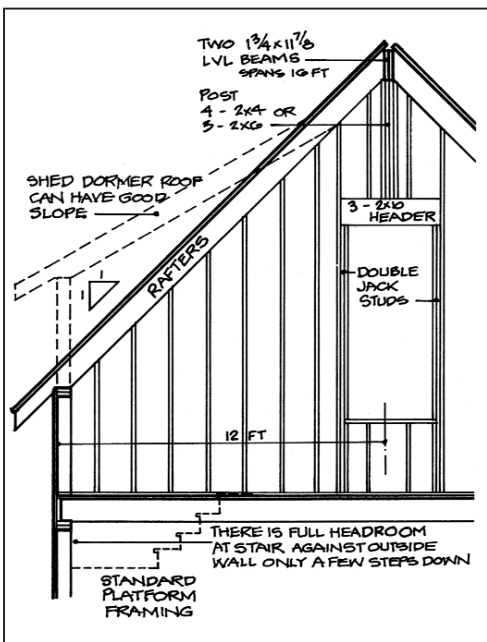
A structural ridge made of LVL beams and supported by posts can prevent bowing in half-walls that are platform framed. The posts and headers should be sized to carry the beam's load down through the house to the foundation.
